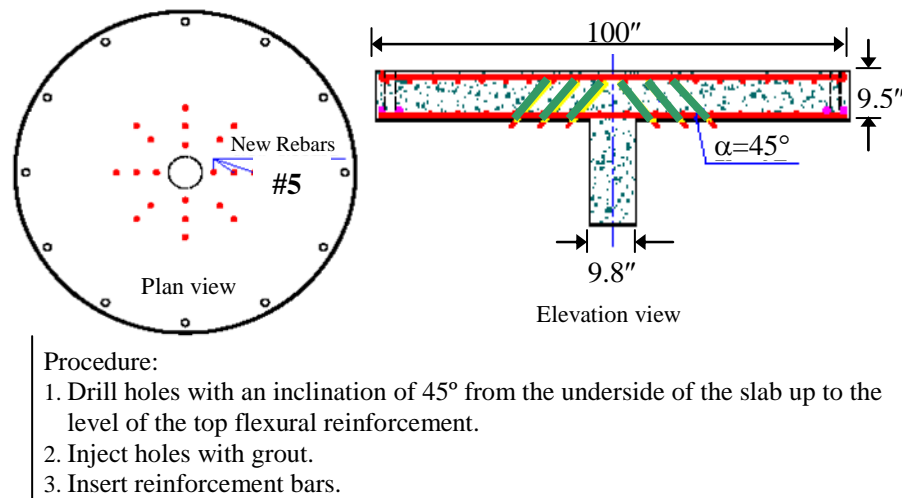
Installation of reinforcing bars (Hassanzadeh and Sundqvist 1998)
